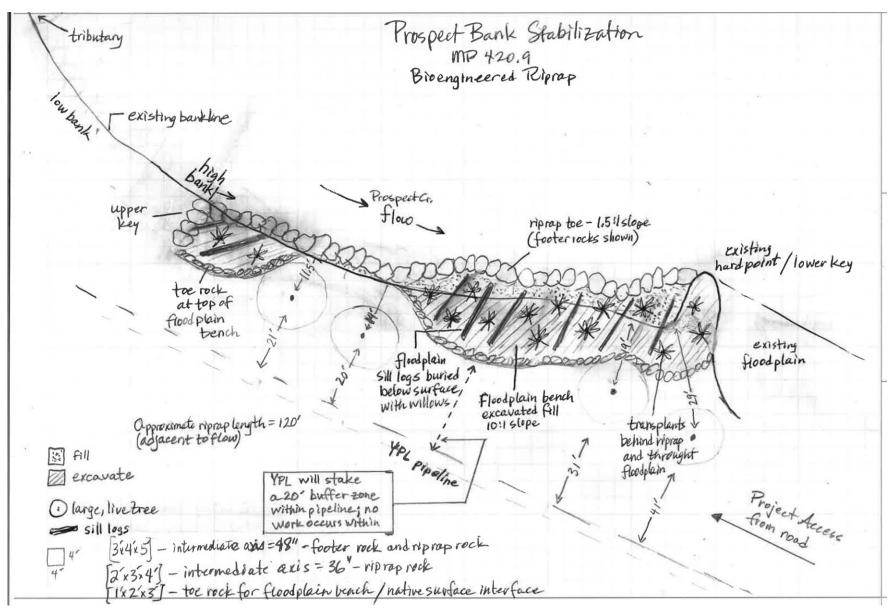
Project plan view sketch. No work may occur within a 20 ft buffer zone around the pipeline (it will be staked prior to ground disturbing activities commence).
